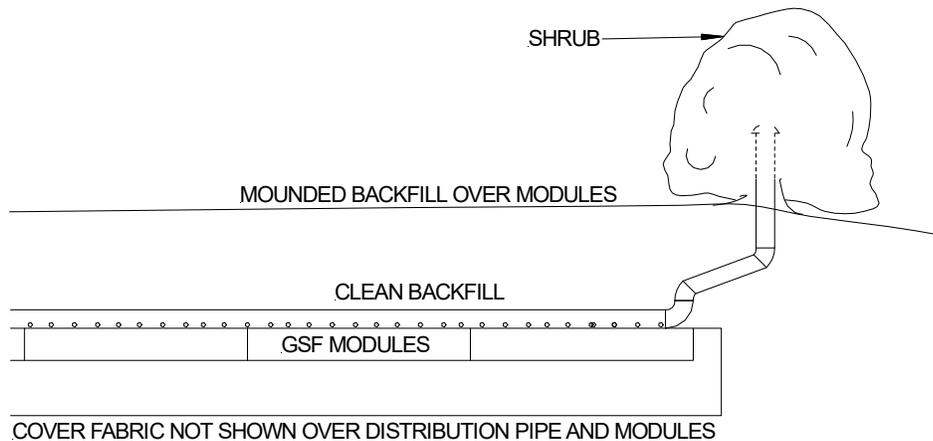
AIR BY-PASS LINE PLAN VIEW FOR VENTING OF PUMPED SYSTEMS
